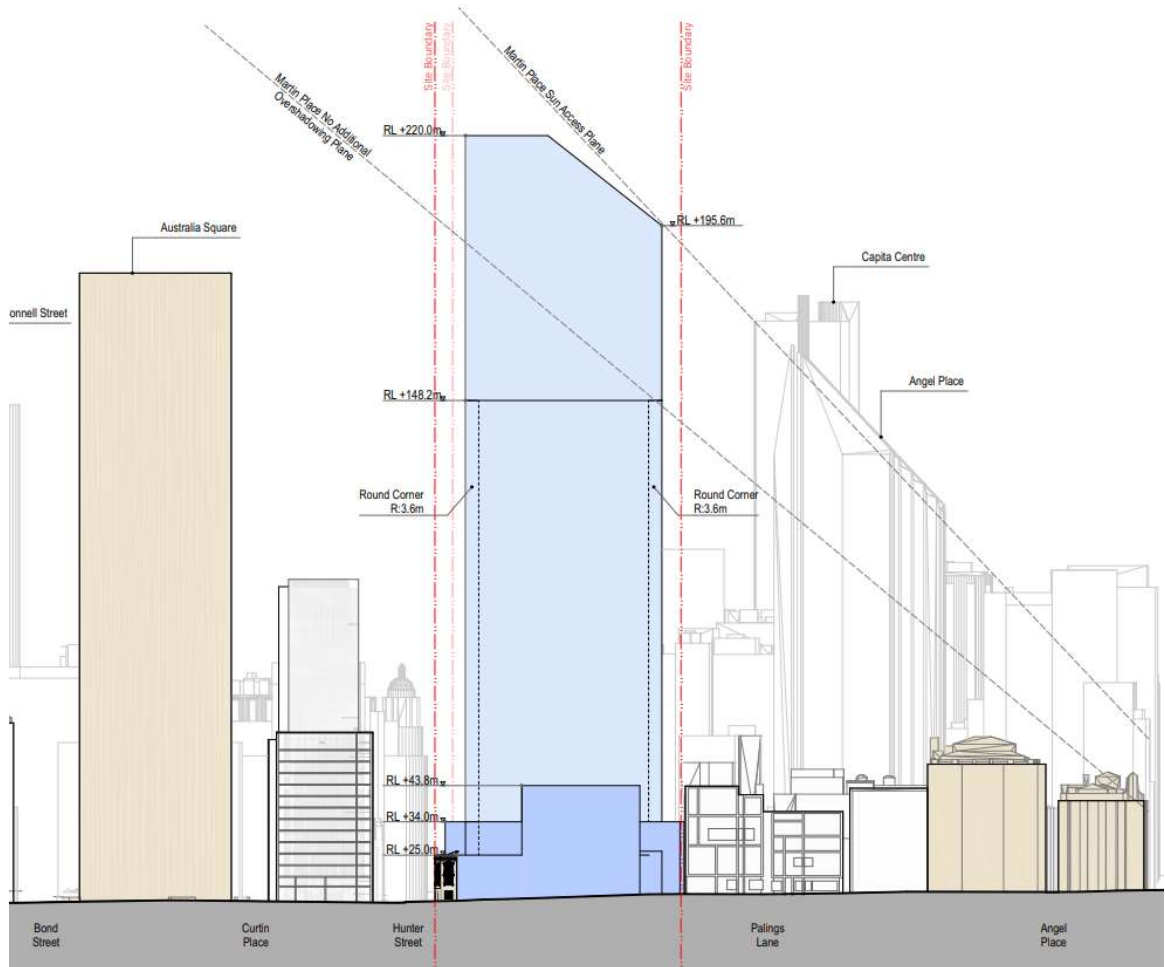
West elevation of Hunter Street West planning envelope. Source FJMT Studio, December 2021
